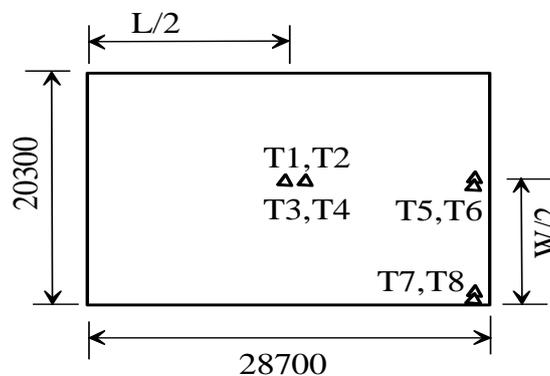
Temperature measured points (T1-T8) of the concrete underground abutment (mm)
